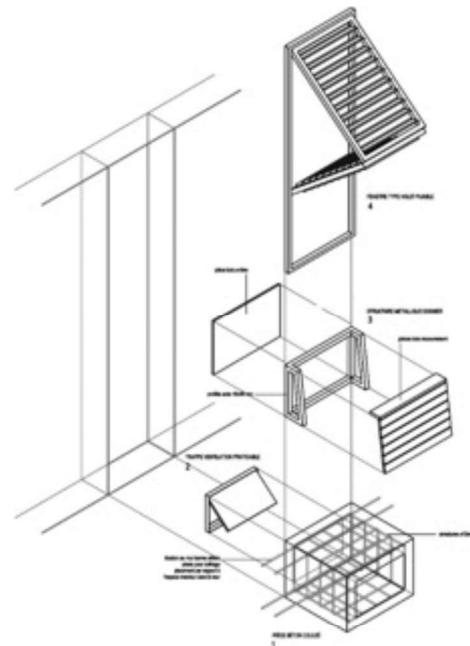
Details of the louvered shutter systems installed in Lycee Schorge © Kéré Architecture
